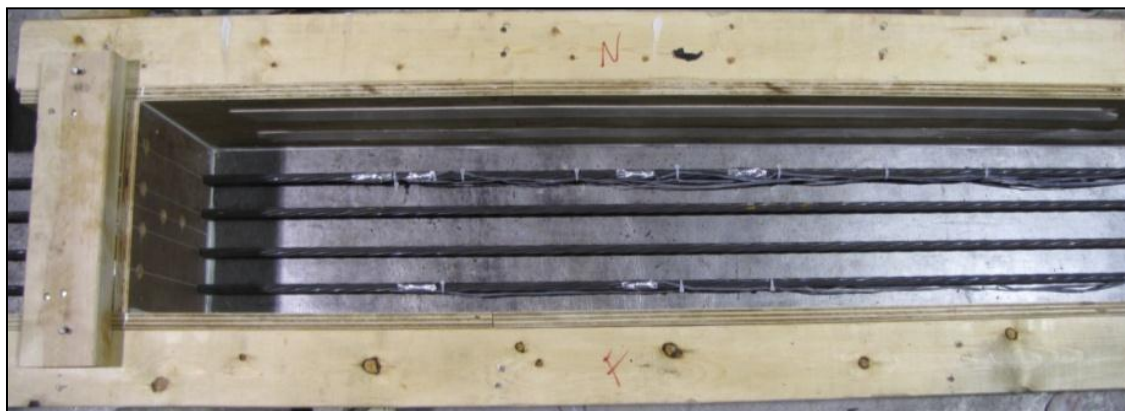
Instrumented Bottom Prestressing Strands in the Form
